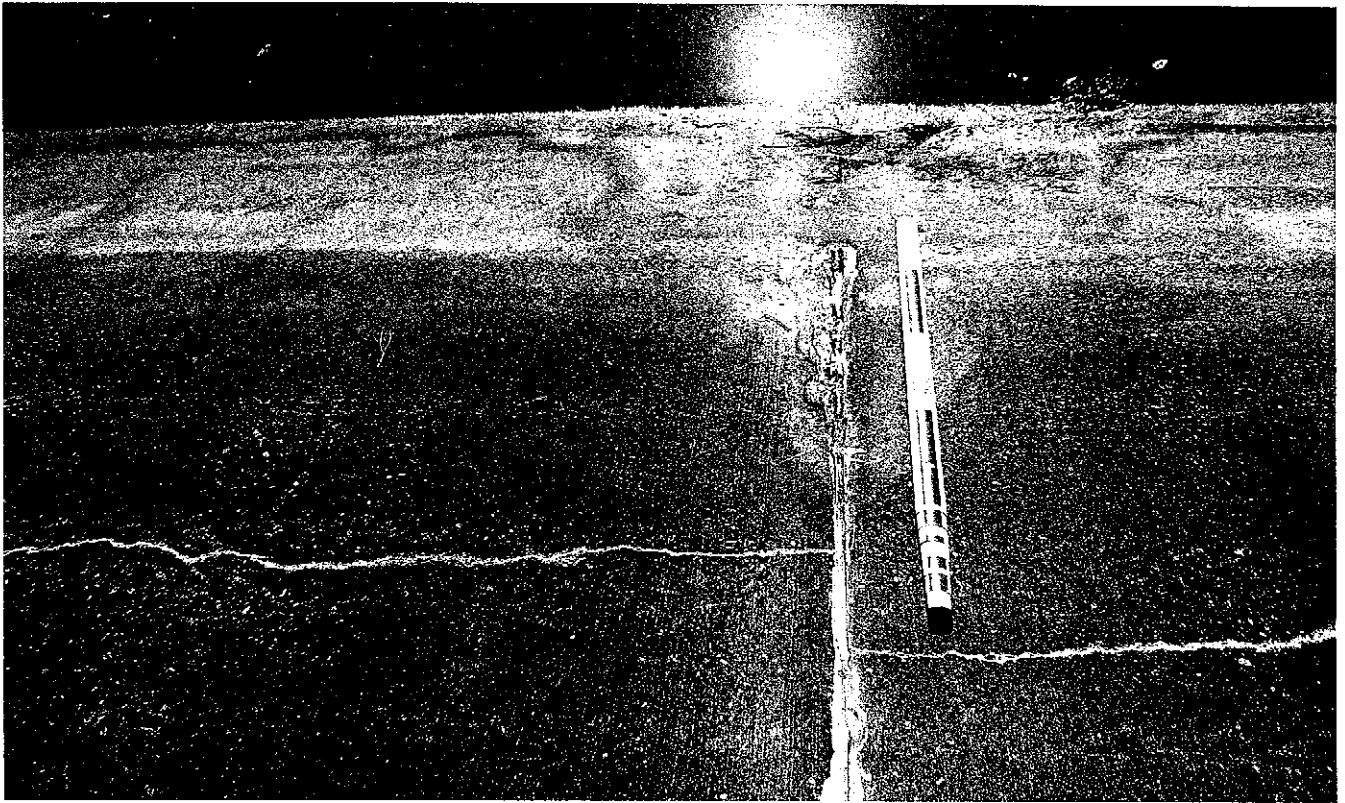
Downstream slope. View is of seepage from a joint on the downstream slope. Note that the seepage was emanating from a point several feet above the downstream toe of the embankment. Longitudinal cracks were present in the embankment's concrete cover.
